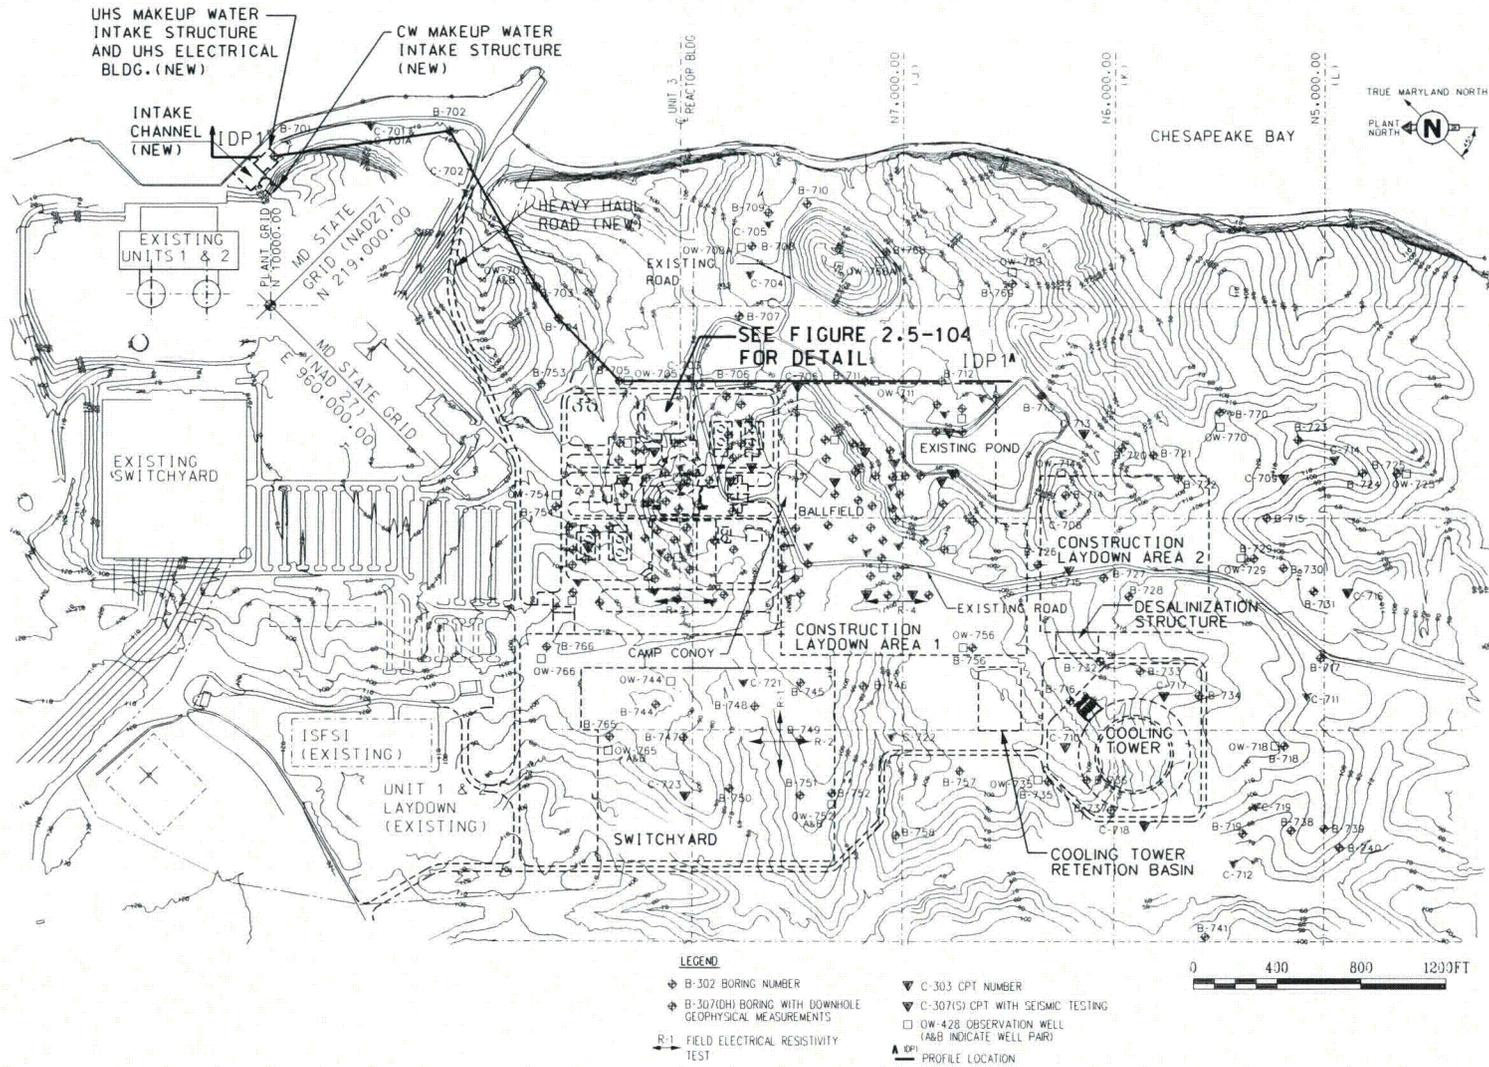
(REVISED) {Excavation Profile IDP1}
